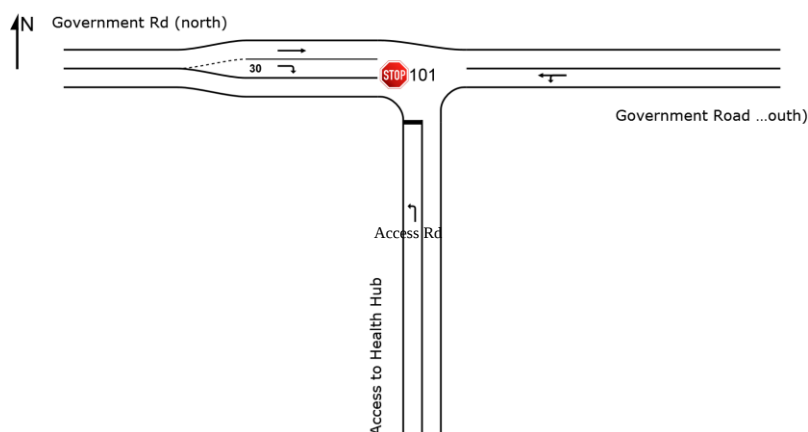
Proposed Intersection Layout – Left In and Right In / Left Out Only
